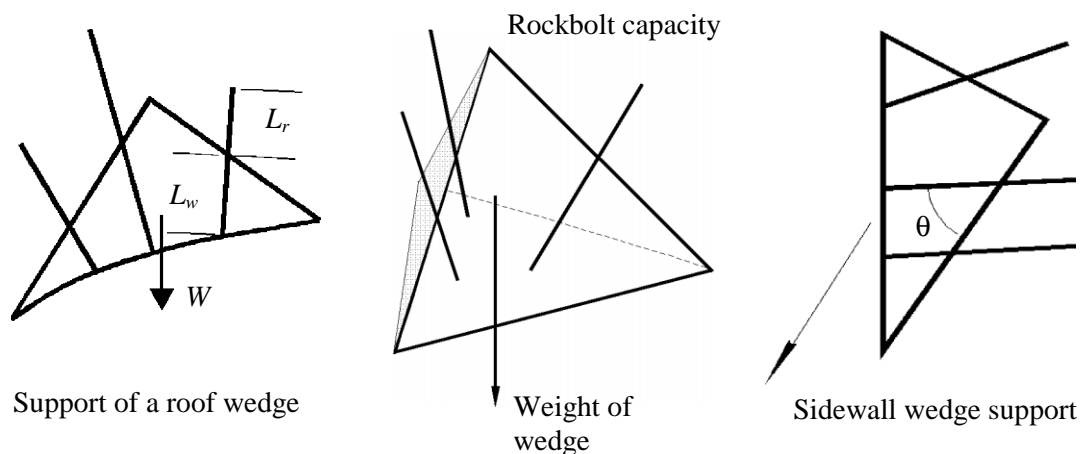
Rockbolt support mechanisms for wedges in the roof and sidewalls of tunnels
